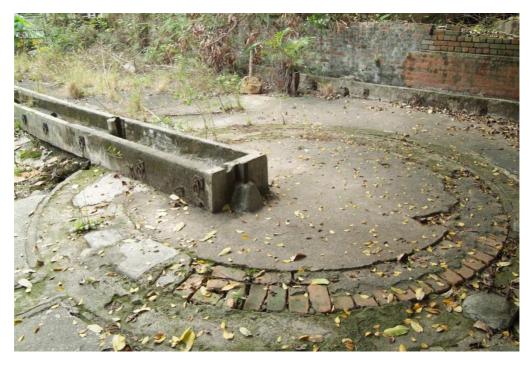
Current Condition of water pond in water pond zone Source: photo by the author
